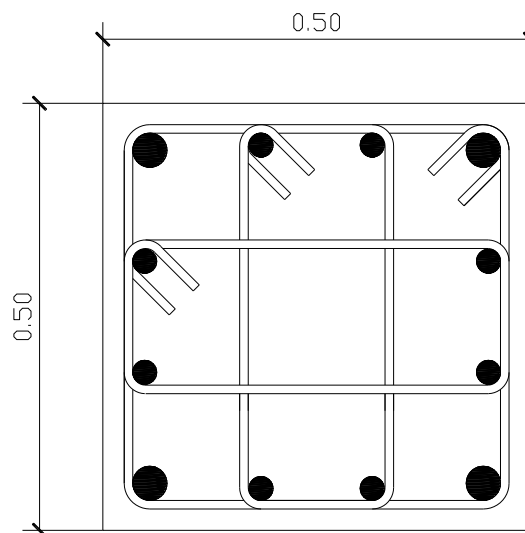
Cross-section of columns C7, C8, C9 and C10 (longitudinal reinforcement 4Φ18 & 8Φ14)
